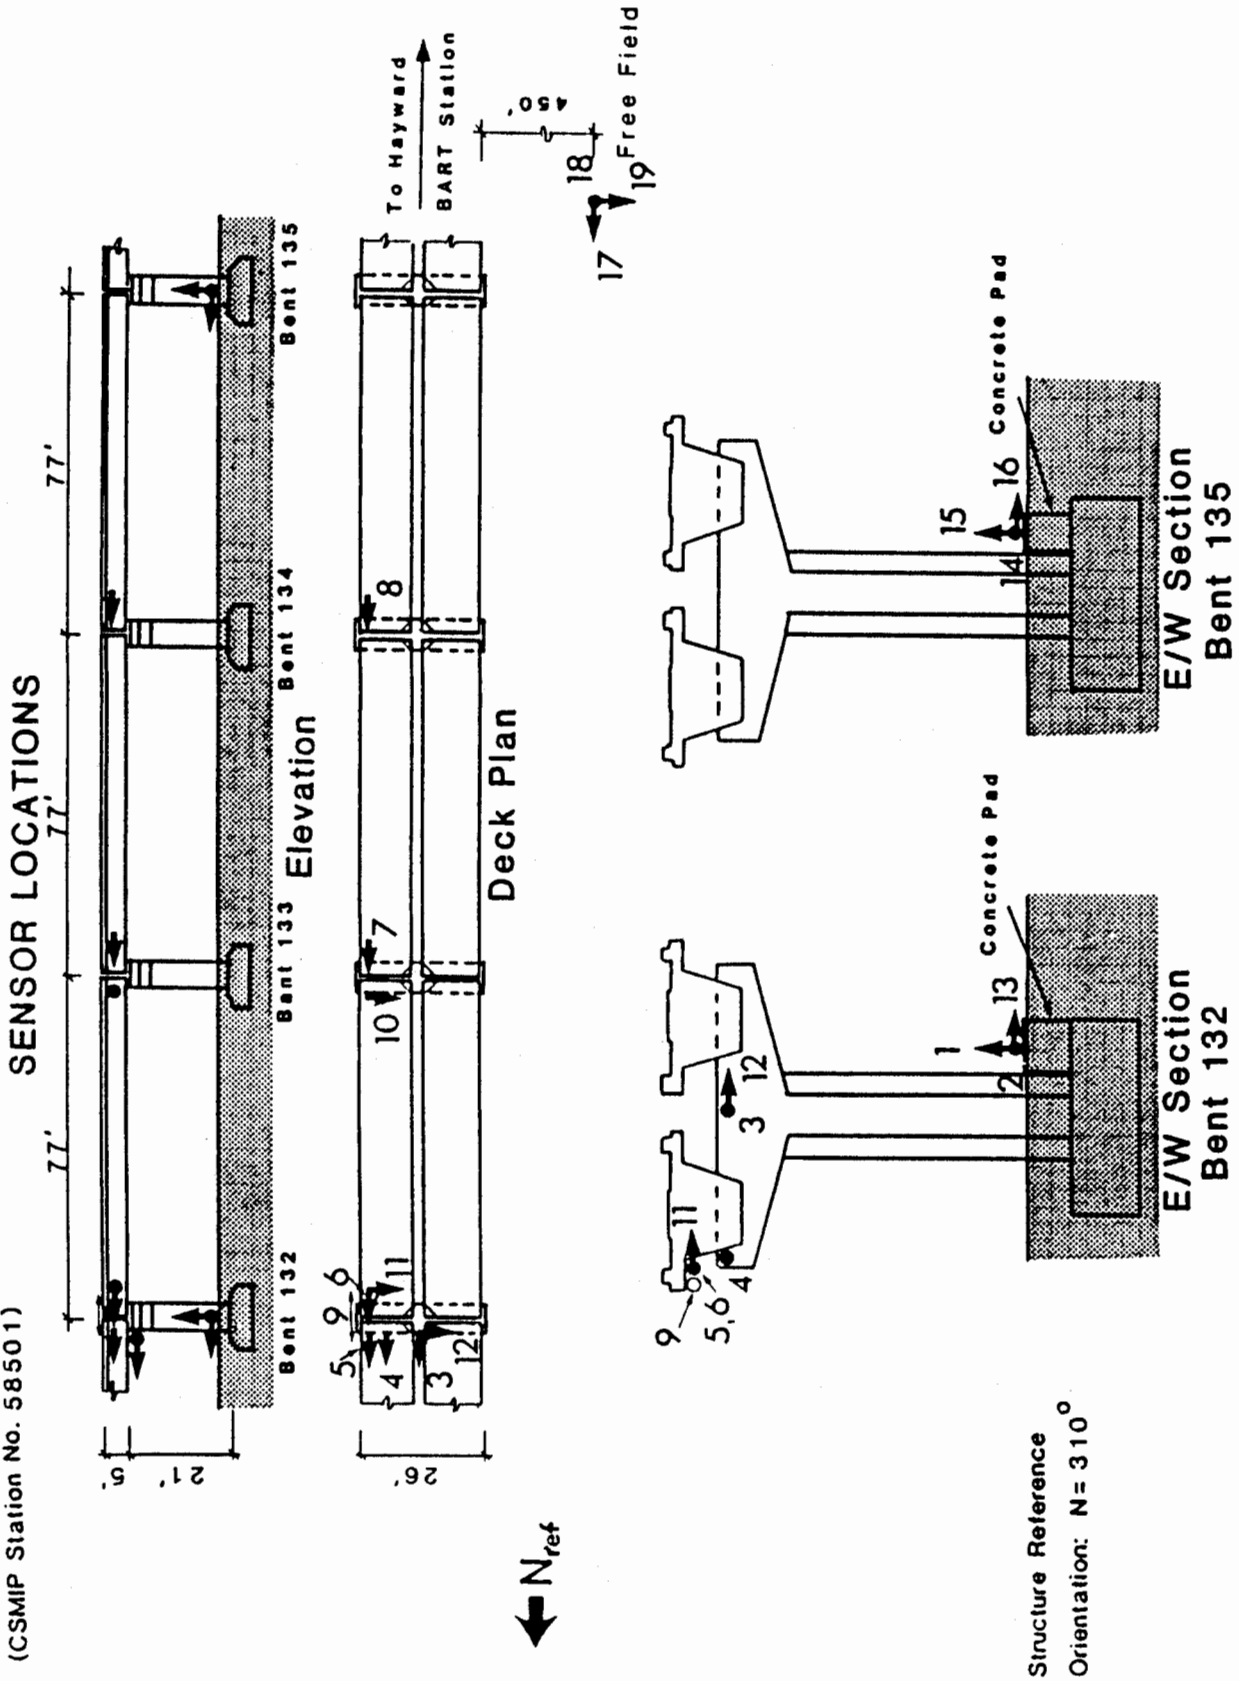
Structure Configuration of Hayward-BART Elevated Section and Sensor Locations
